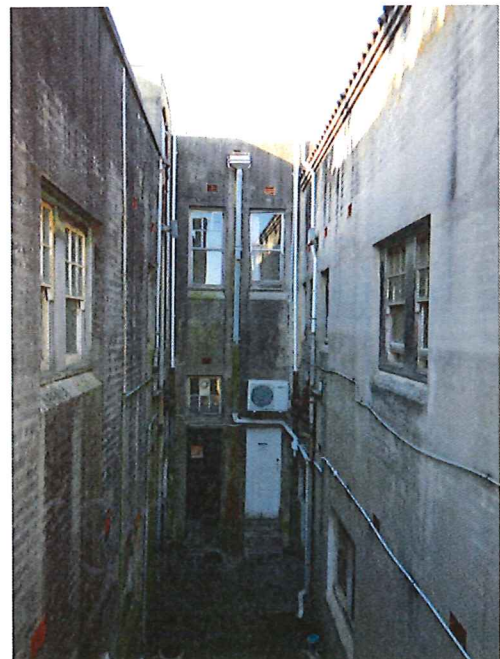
Facade to internal courtyard. There is evidence of previous repairs to the walls
